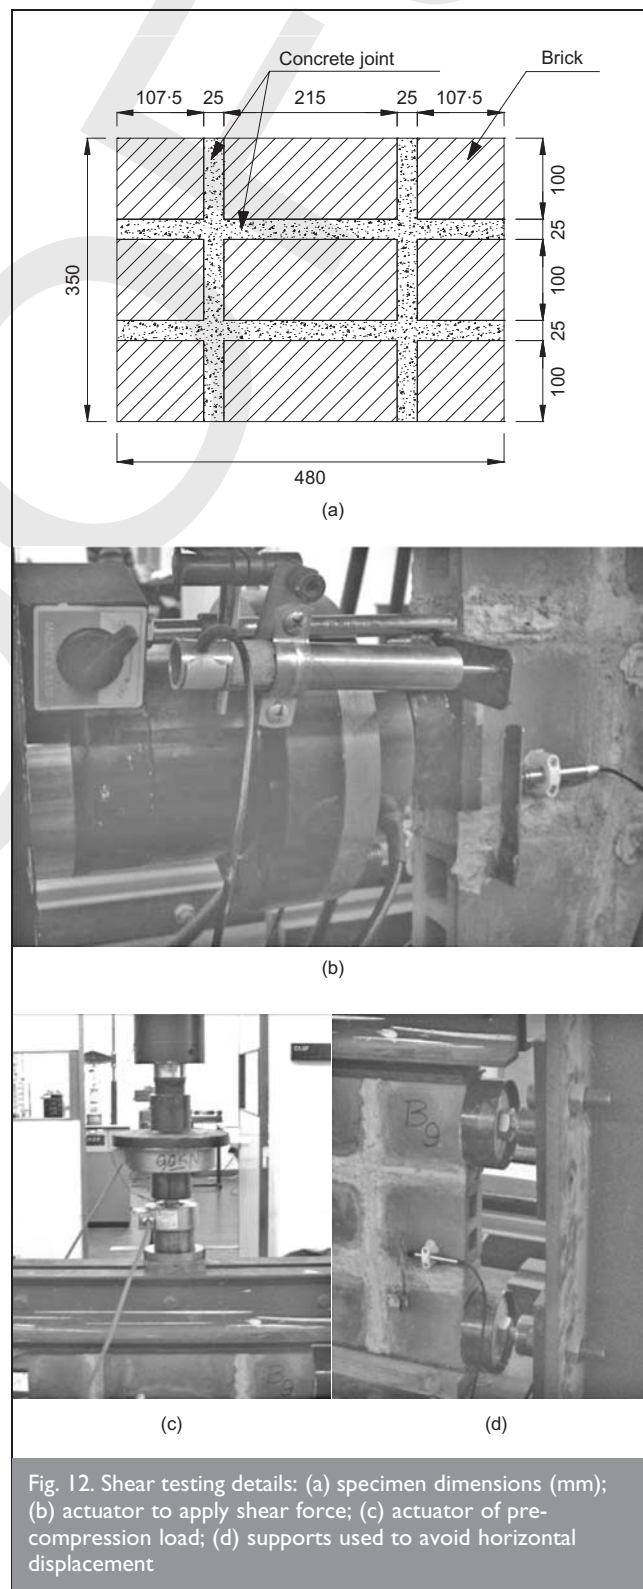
Shear testing details: (a) specimen dimensions (mm); (b) actuator to apply shear force; (c) actuator of pre-compression load; (d) supports used to avoid horizontal displacement
